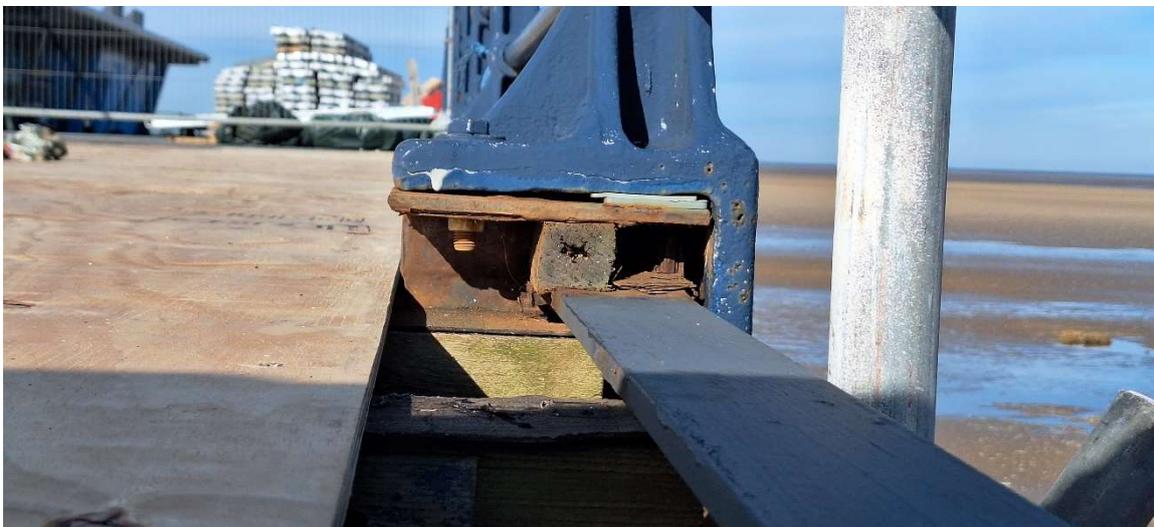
Handrail base detail to South side of deck in Area 3,
